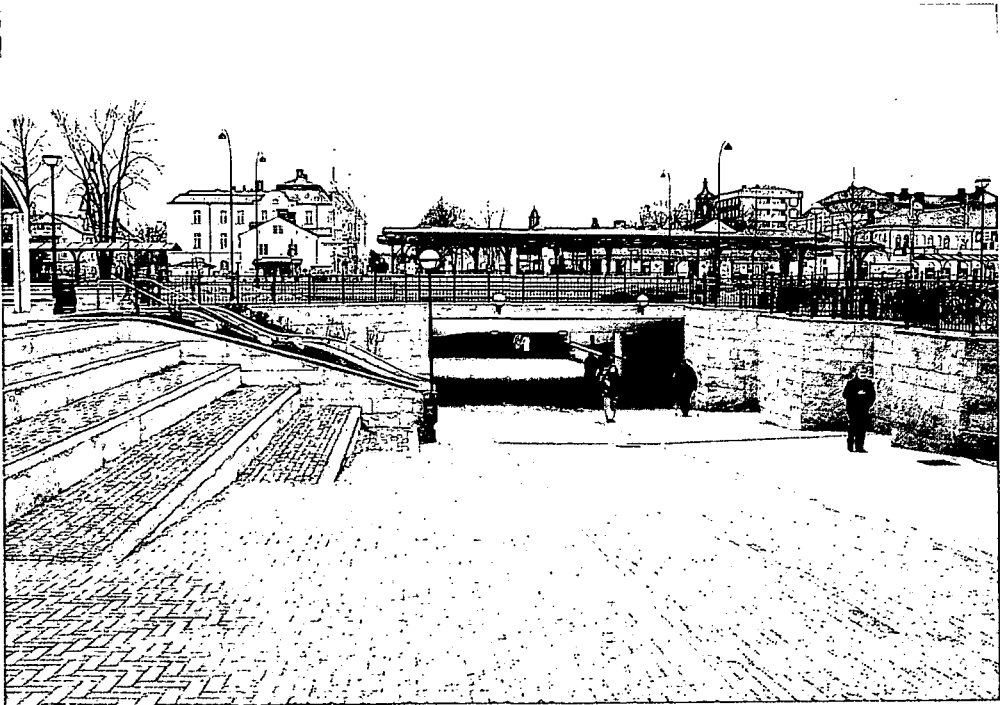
Katrineholm Station (Sweden) - tunnel
